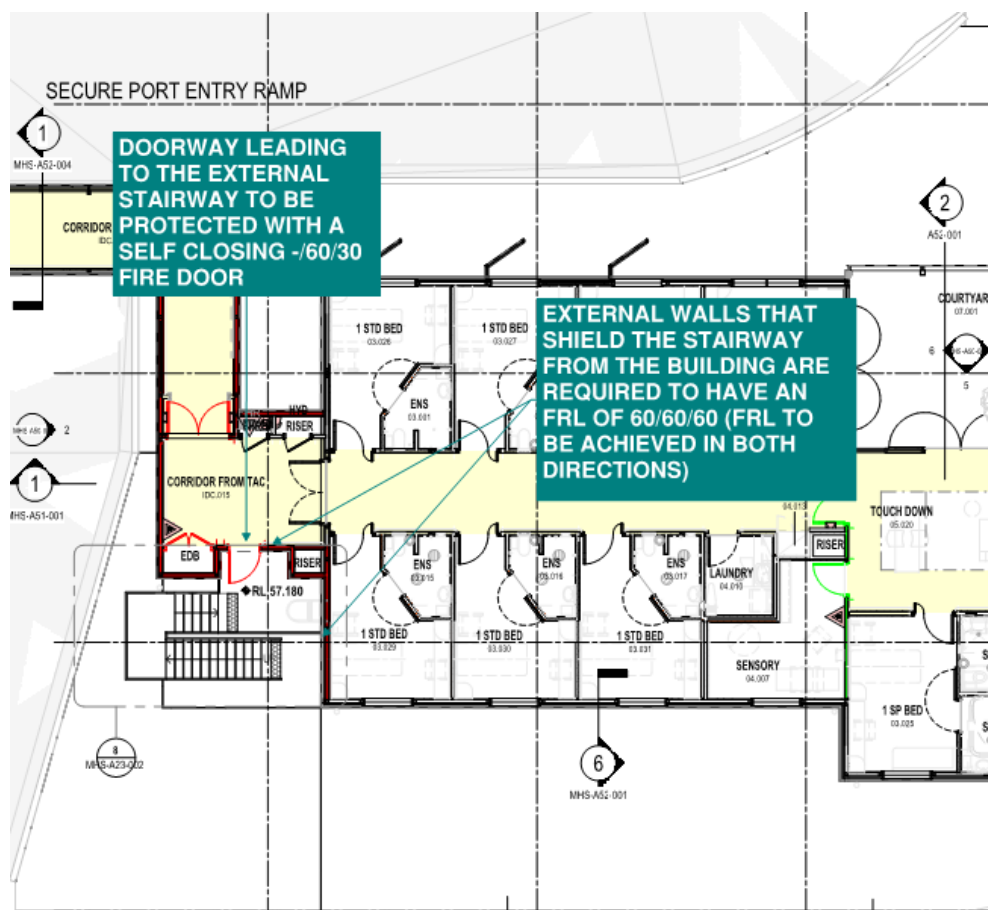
Required protection to the external stair provided in lieu of fire isolated stairway on Level 02
